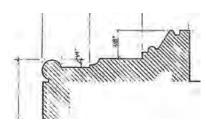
Trim for Door 8 and Windows 9 and 10. Section detail.
